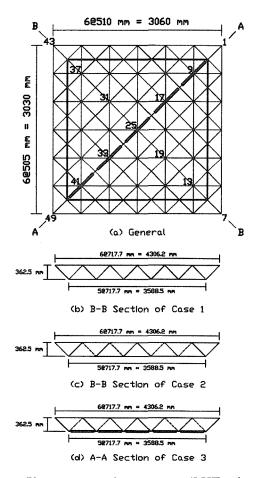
Planar arranged structure (SCST) for hypar space truss
